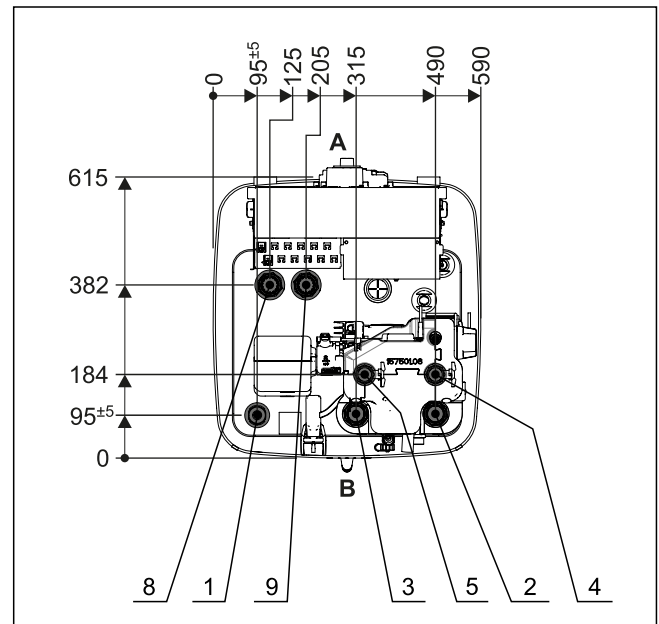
Dimensions, top of unit – type ETS(X/H)B16P30D
